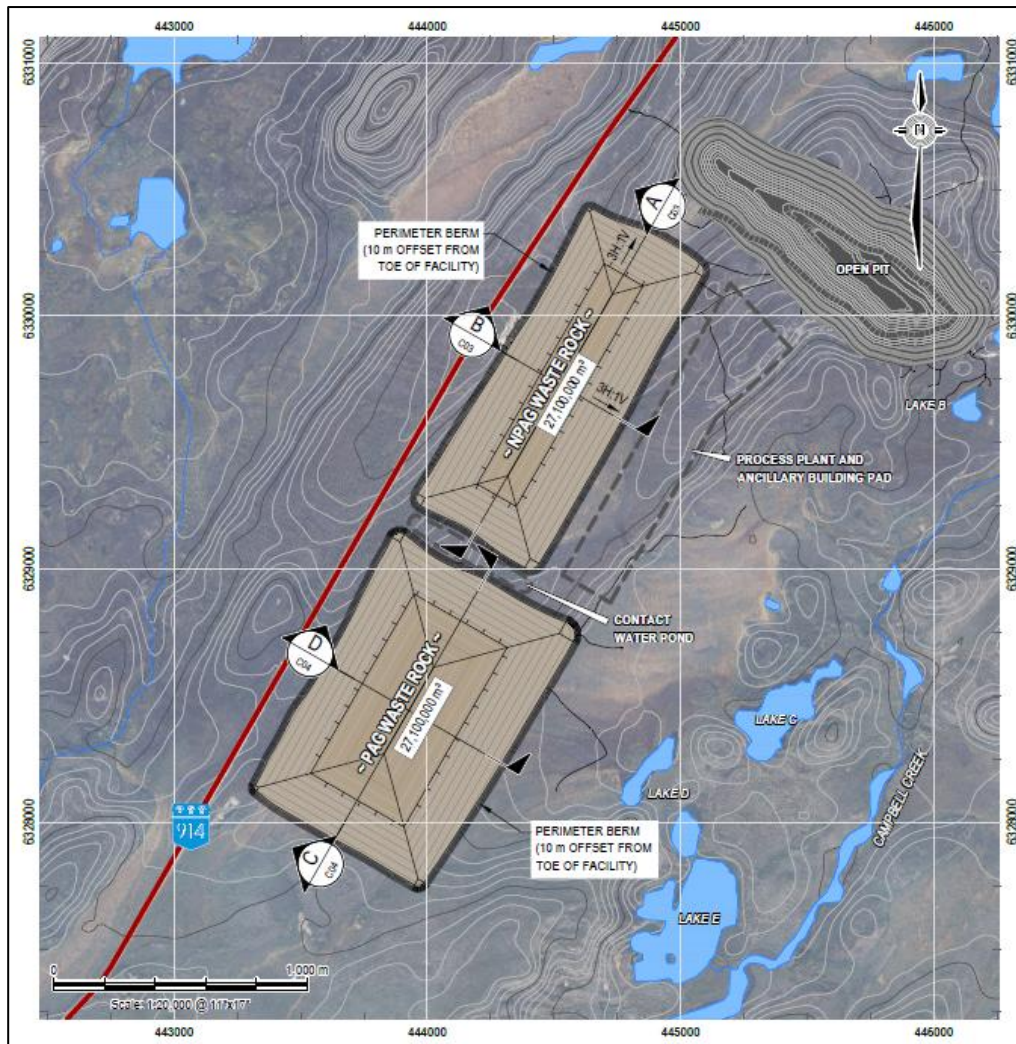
WRTCF Plan (Tetra Tech, 2026)
